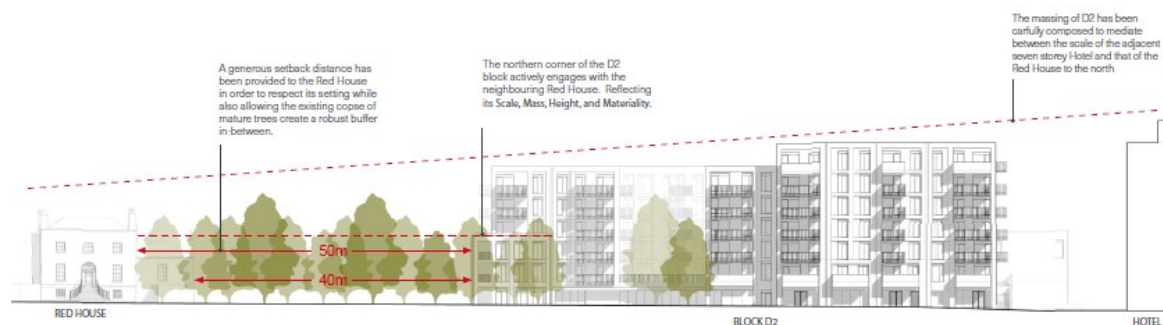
Extract from architects' drawings indicating 40 plus metre offset to south of Red House and building heights stepping down on those closer
